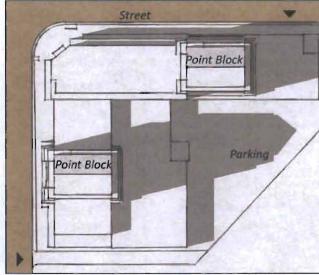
Conceal Parking by Locating it Behind Buildings
